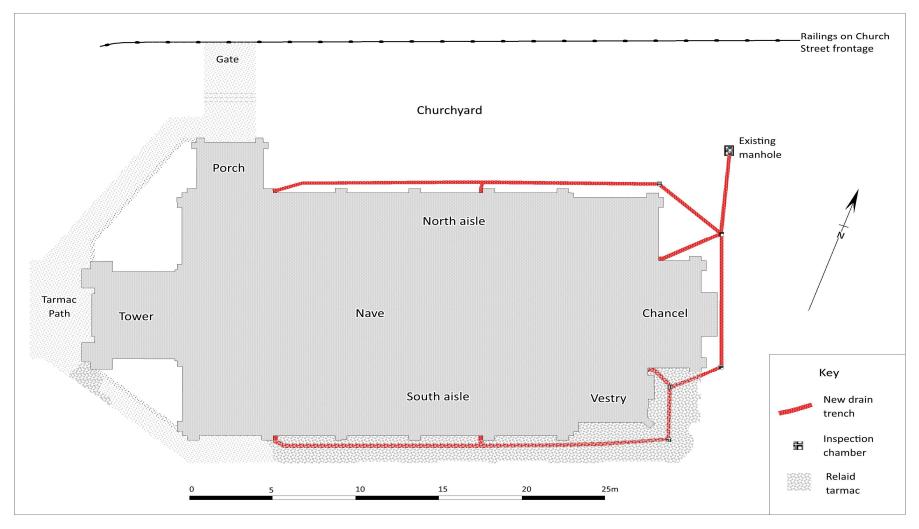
Outline plan of Lenton Church, showing location of excavated drainage trenches and inspection chambers, scale 1:200 (at A4)
